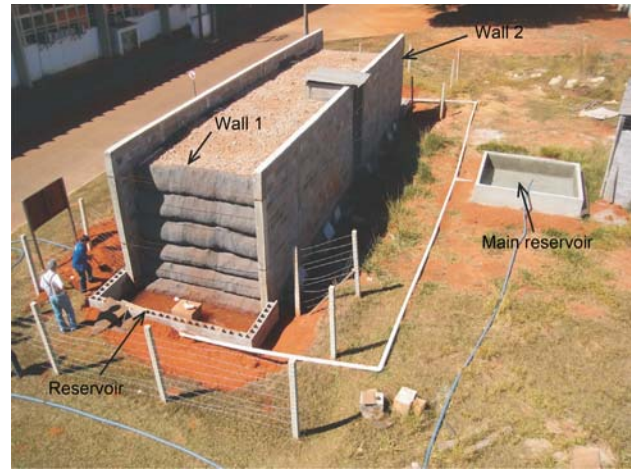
Faces of Walls 1 and 2 at the end of construction.
